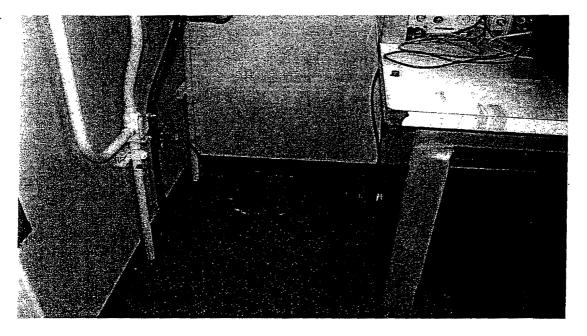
Sub Junction Level, Room SJ1, Southwest Corner.
